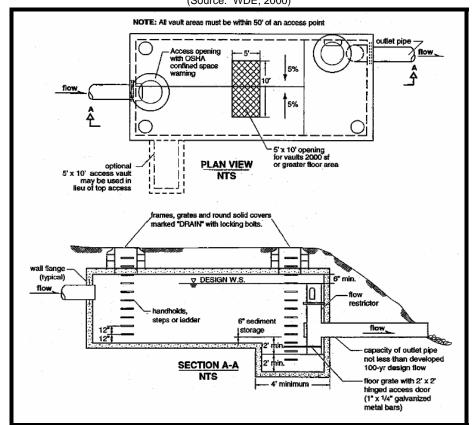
Schematic of a Typical Underground Detention Vault (Source: WDE, 2000)
